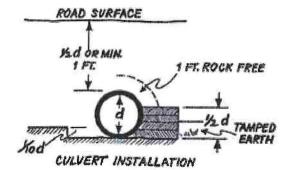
The elements of a properly installed ditch relief culvert. The culvert is angled at about 30 degrees to the road alignment to help capture flow and prevent culvert plugging or erosion of the inlet area. It is set at the base of the fill (ideally) or with a grade slightly steeper than the grade of the contributing ditch (but never with a grade less than 2 percent) (USDA-SCS, 1983). At a minimum, the grade of the ditch relief culvert should be sufficient to prevent sediment accumulation at the inlet or deposition within the culvert itself (it should be self-cleaning) (USDA-SCS, 1983).
